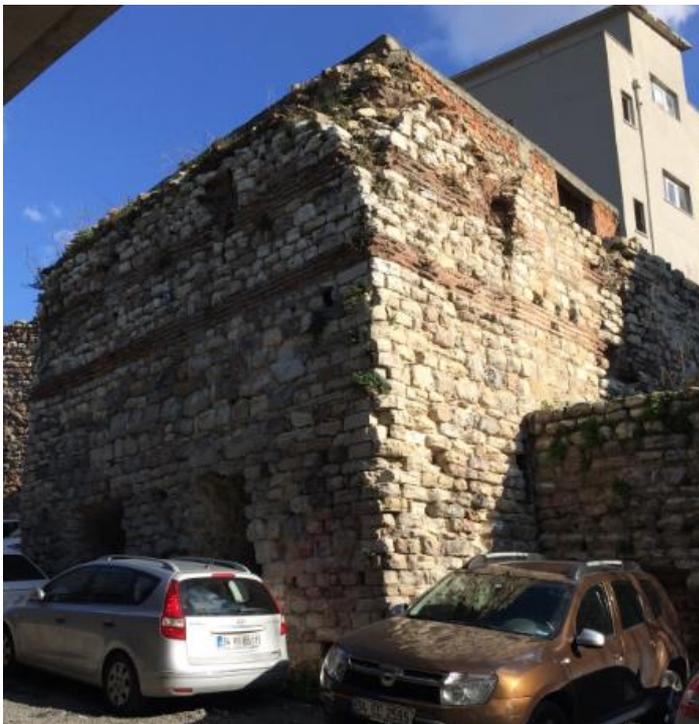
The tower of section no. 3 and wall courses at its SW and SE (Author, 2015)
